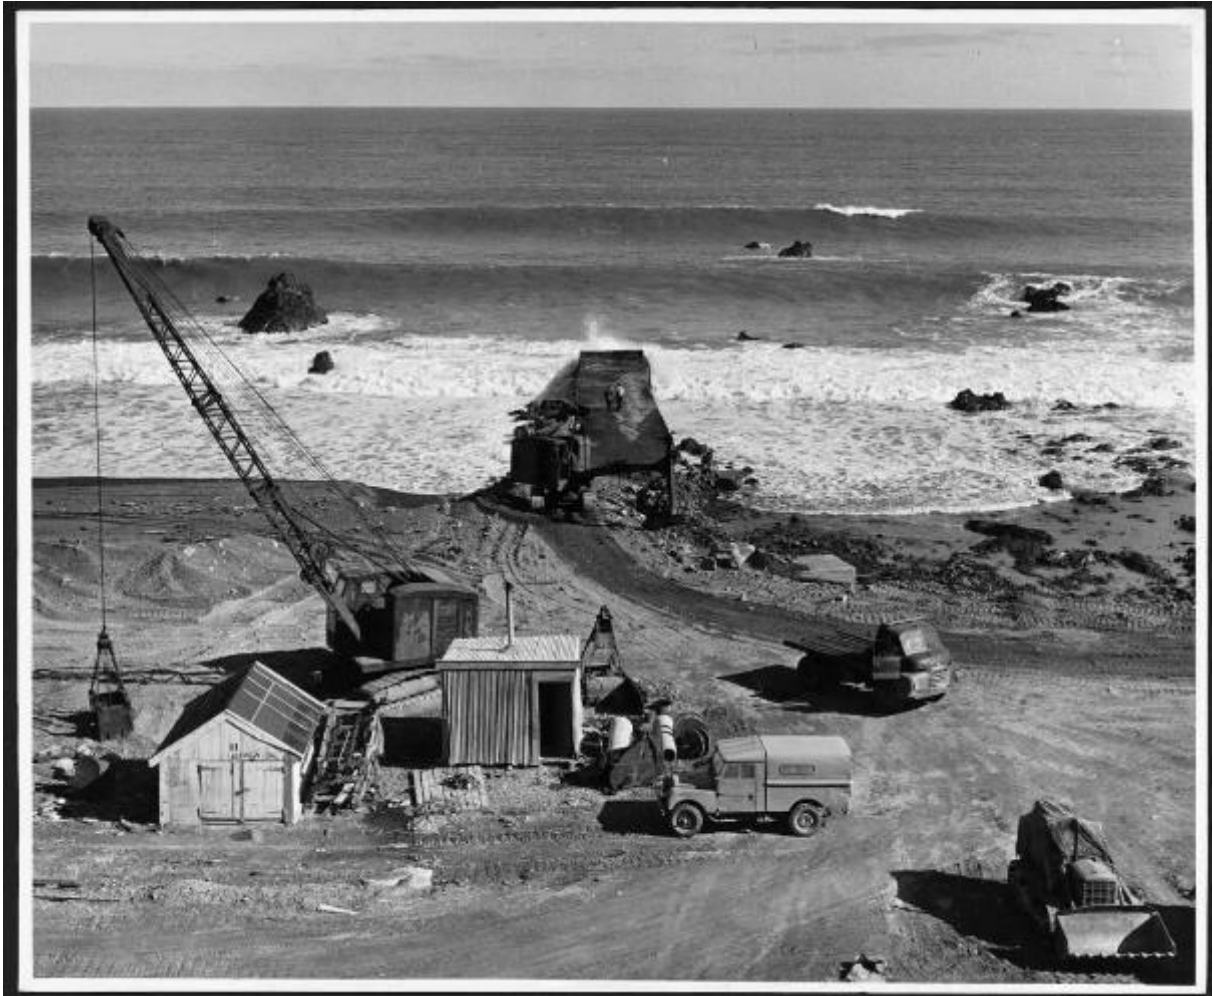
Sewerage outlet at Pencarrow. Dominion post (Newspaper):³
